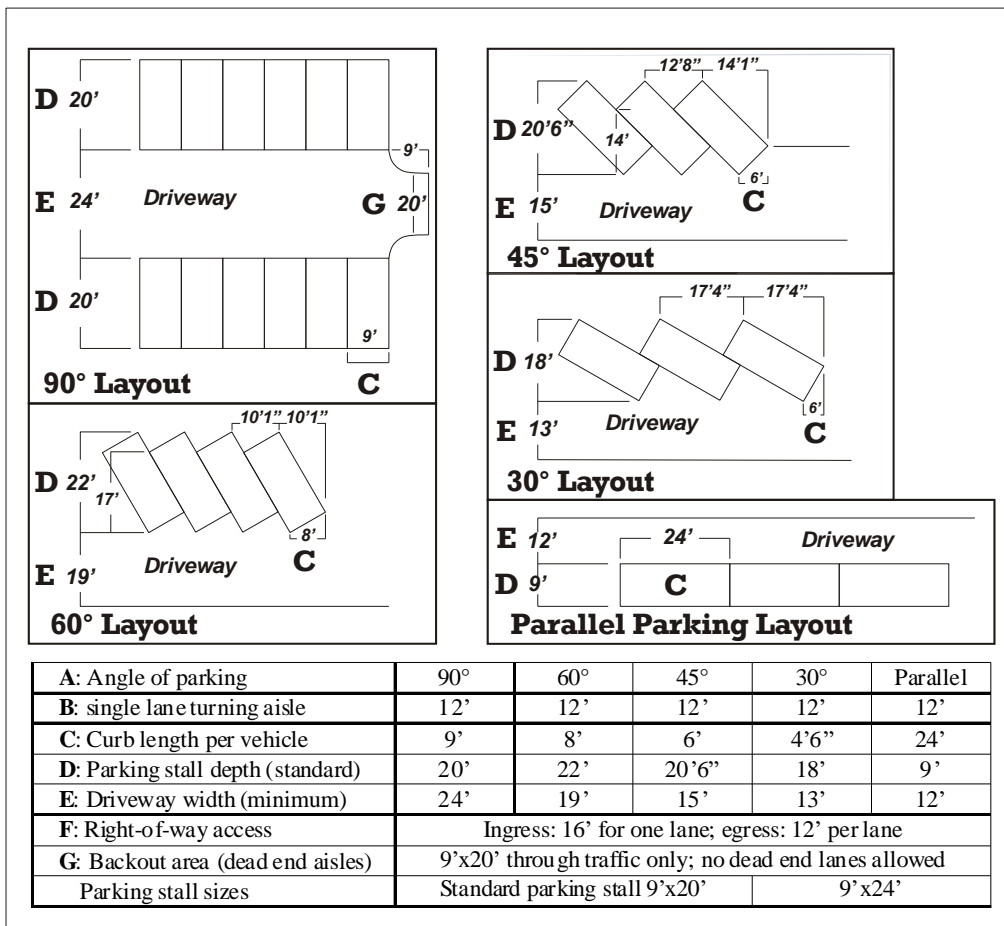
Parking Lot Specifications and Dimensions
